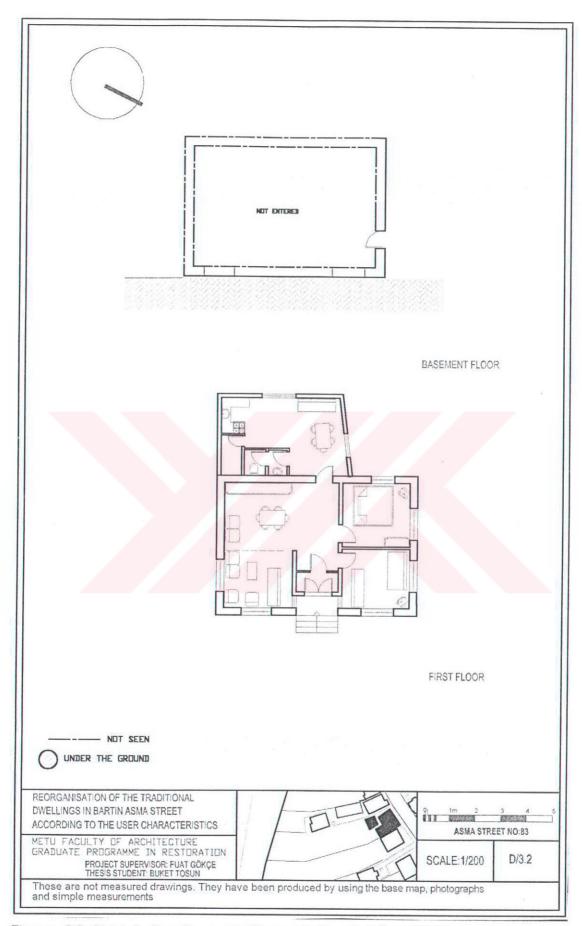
Sketch Drawings of Plans of The Building No:83
